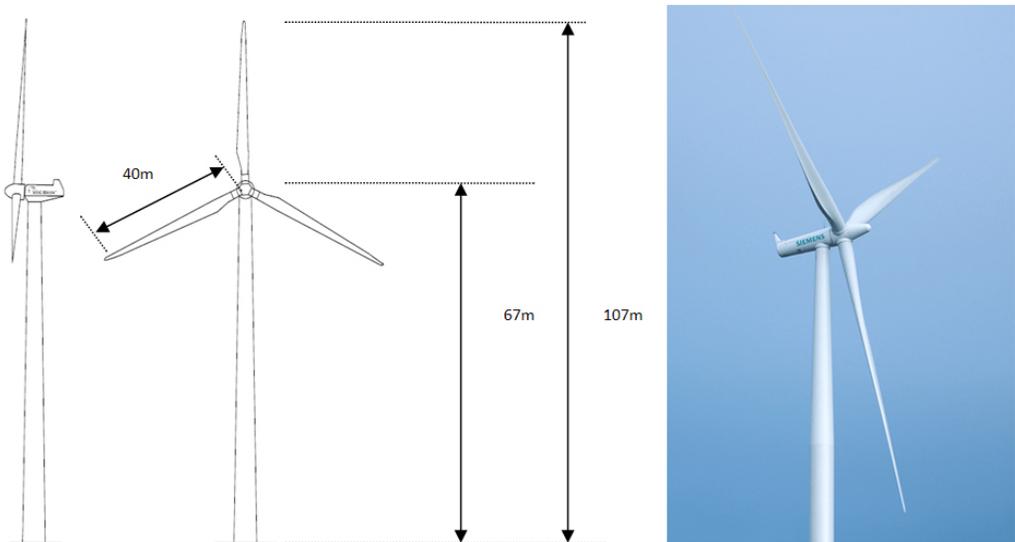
Technical drawing of front and side elevations of Wind Turbine Generator with key dimensions for Siemens SWT 2.3-82V [blade length and heights].
